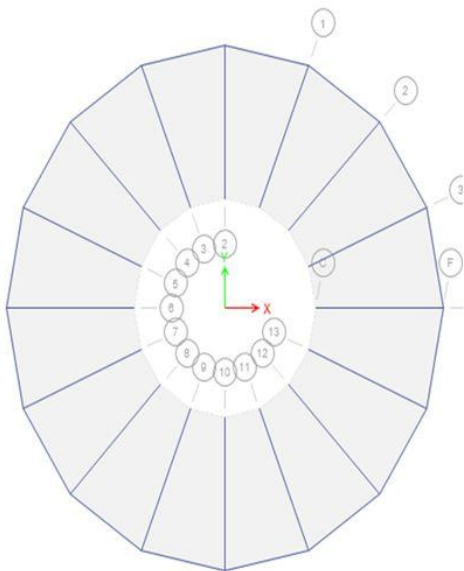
Plan of Circular Diagrid Without Core Shear Wall
